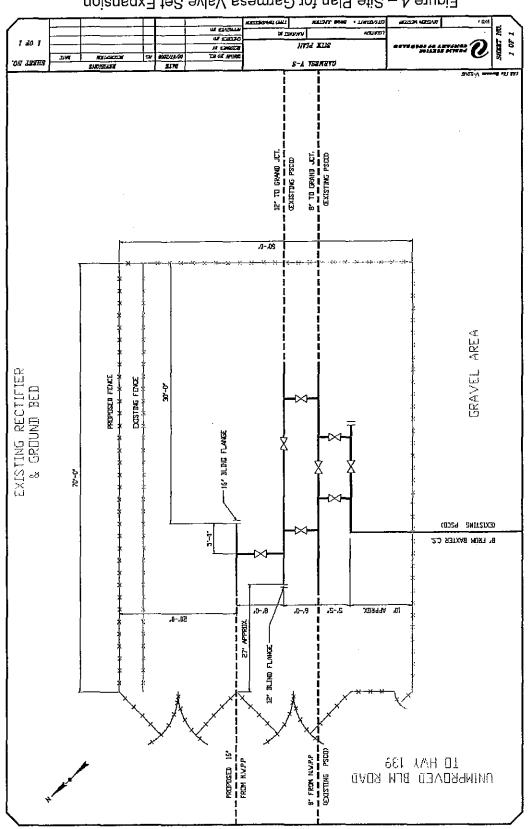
Site Plan for Garmesa Valve Set Expansion
